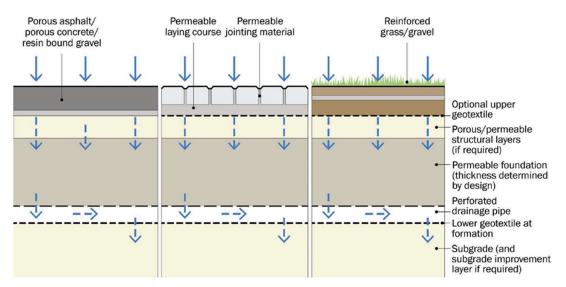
Detail of Type B Pervious Paving (CIRIA C753)
